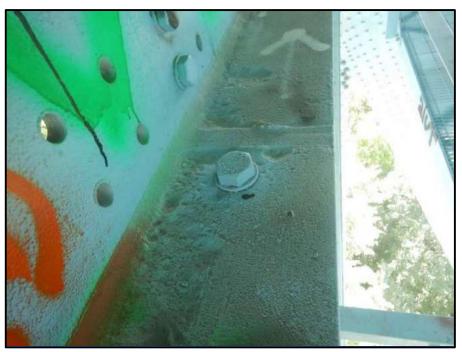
Looking east along top of bottom flange of floorbeam 23, south face, span 3. Note: painted over section loss typically 3/16 inch deep.
